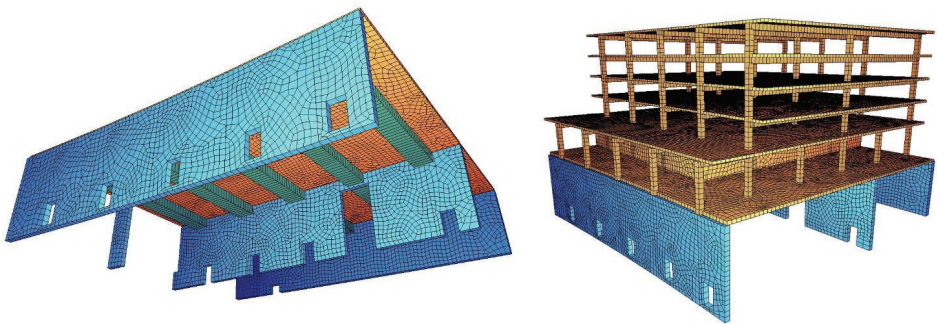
Models of section no 3 without (left) and with (right) buildings placed on the slab
